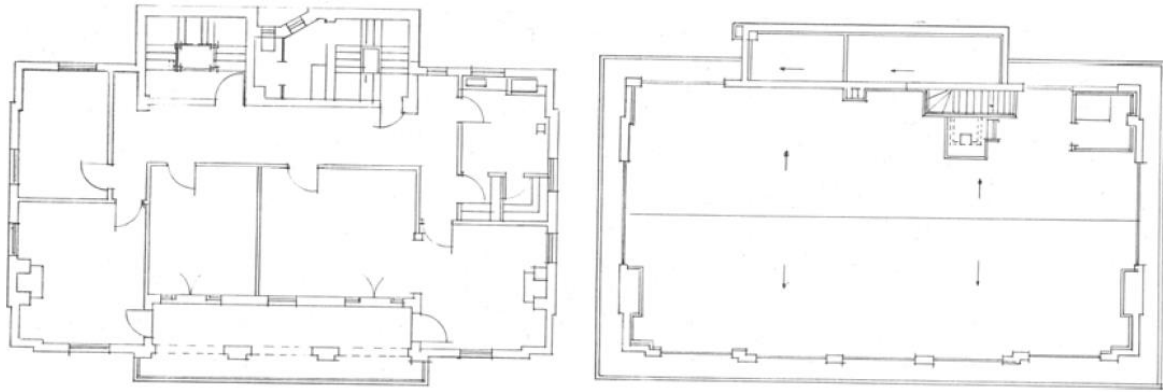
Second floor plan (left) and roof plan of the Bureau of Meteorology, 1962. (Source: TKD 2016: Fig 42).
